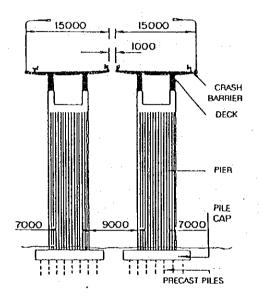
Typical Cross-section of Approach Viaduct
